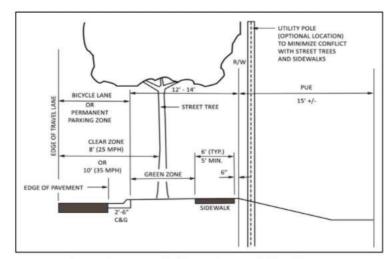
Recommended Green Zone and Sidewalk Zone (Complete Streets Planning and Design Guide)
